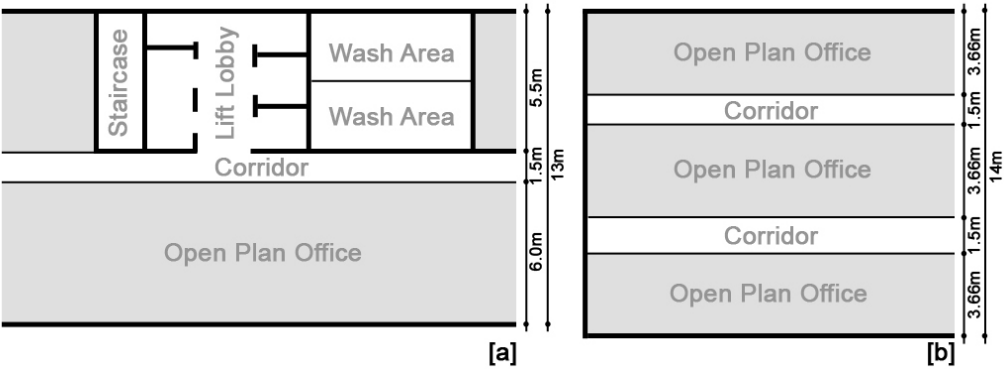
(a): Typical layout Office Building with single-loaded corridor (after Littlefield, 2008).
